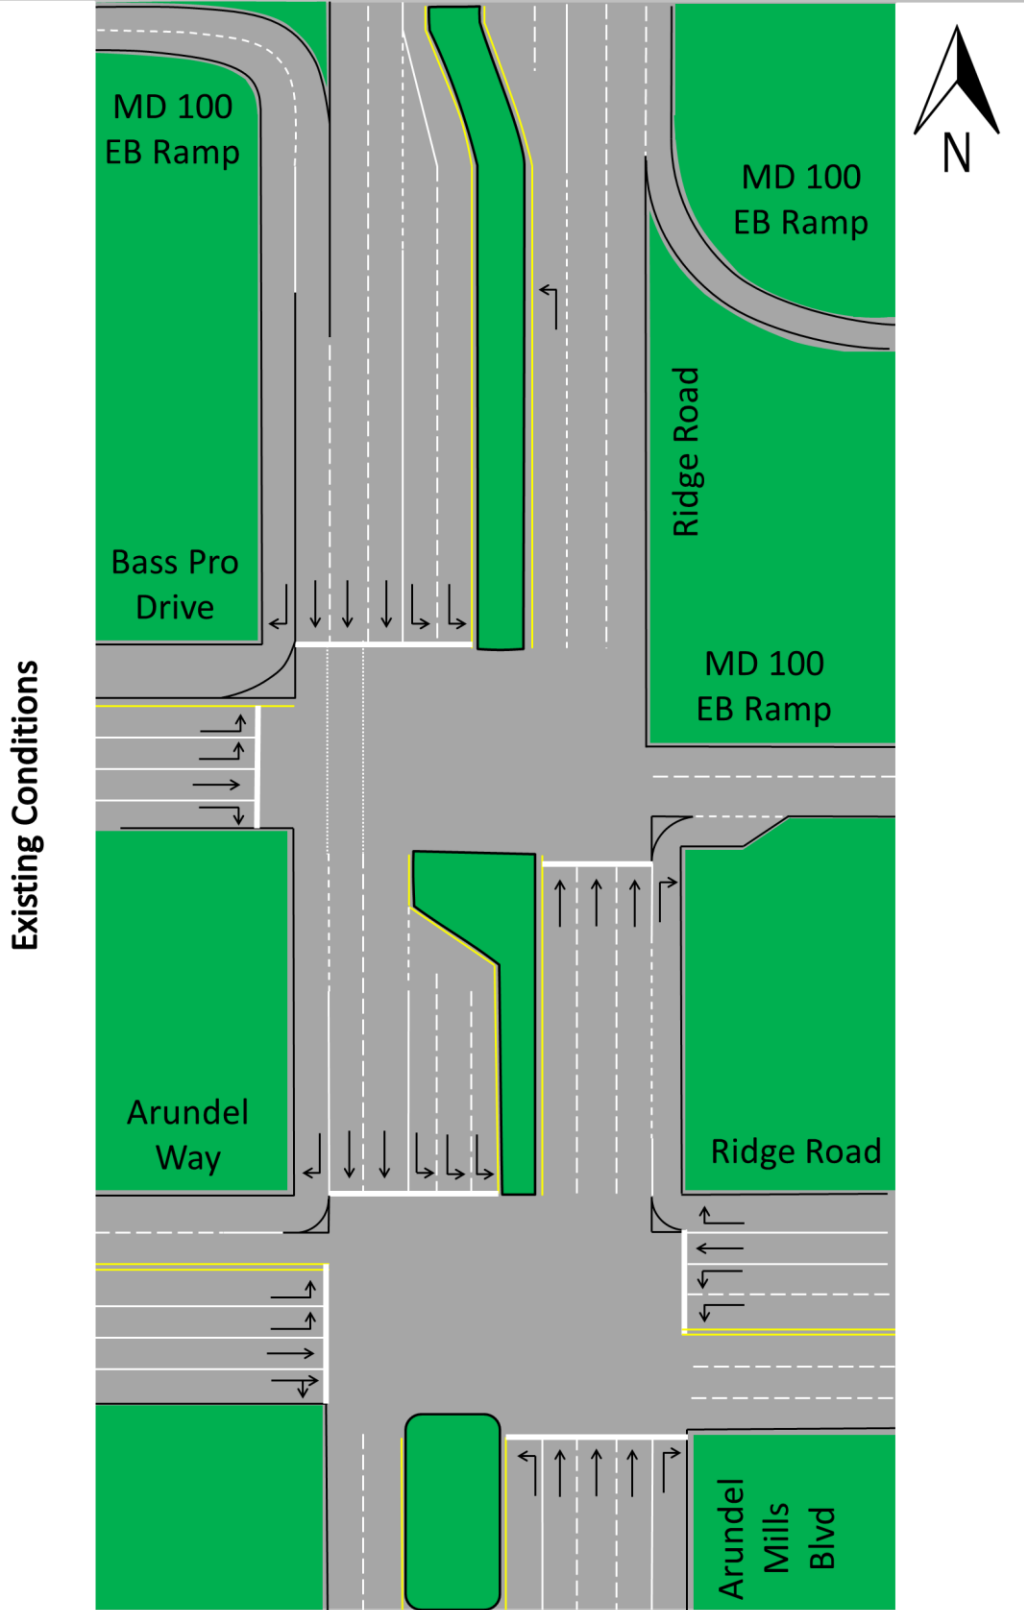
Existing Ridge Road at Arundel Mills Boulevard Weaving Section
